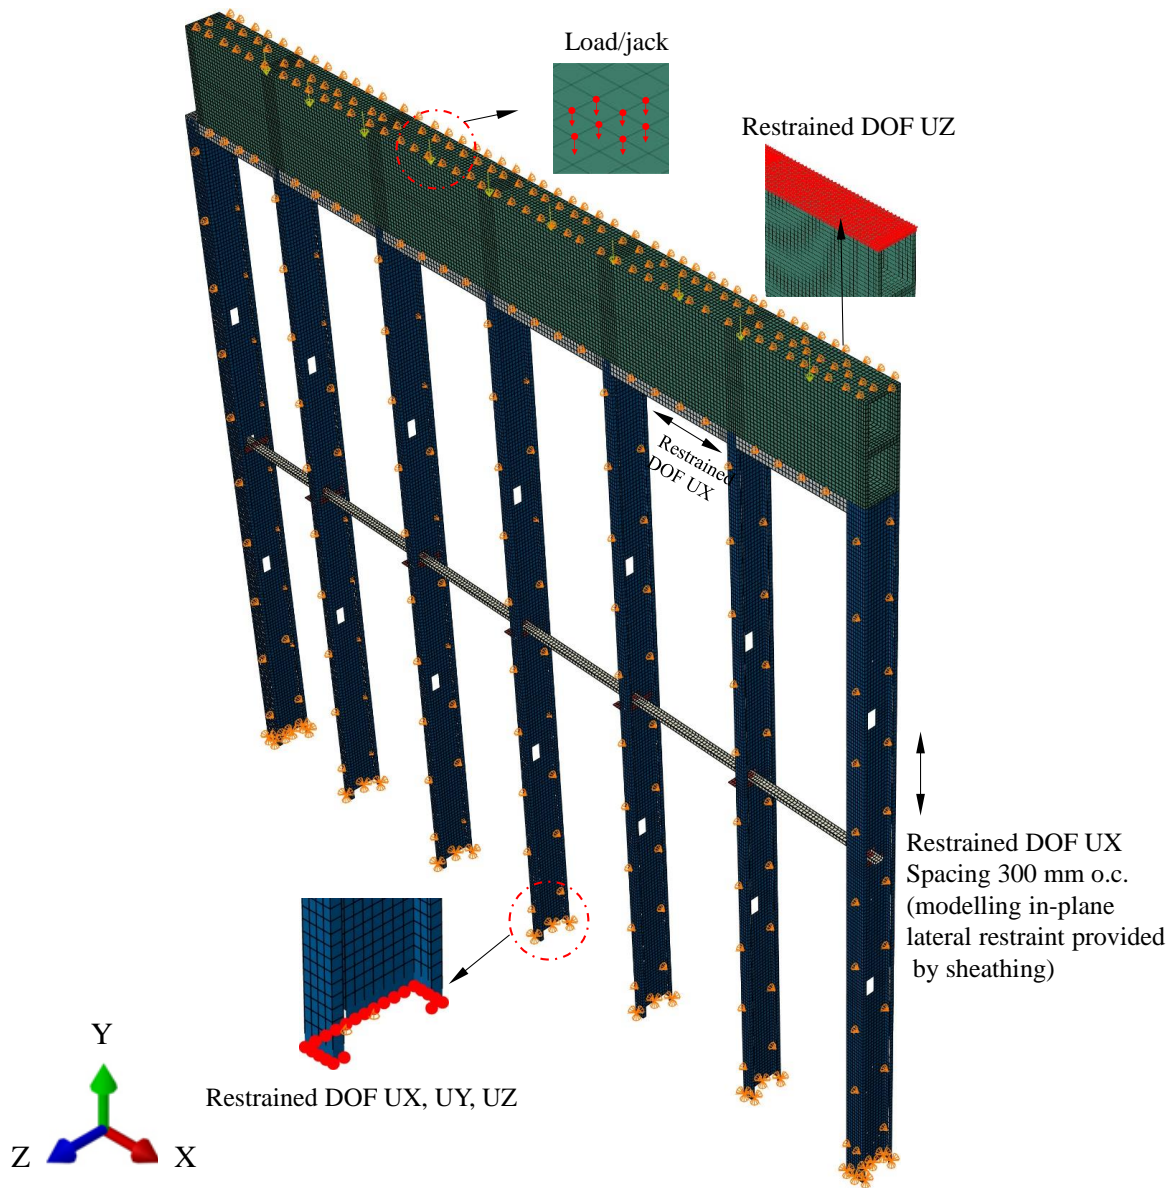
Boundary and loading conditions of CFS wall frame model
